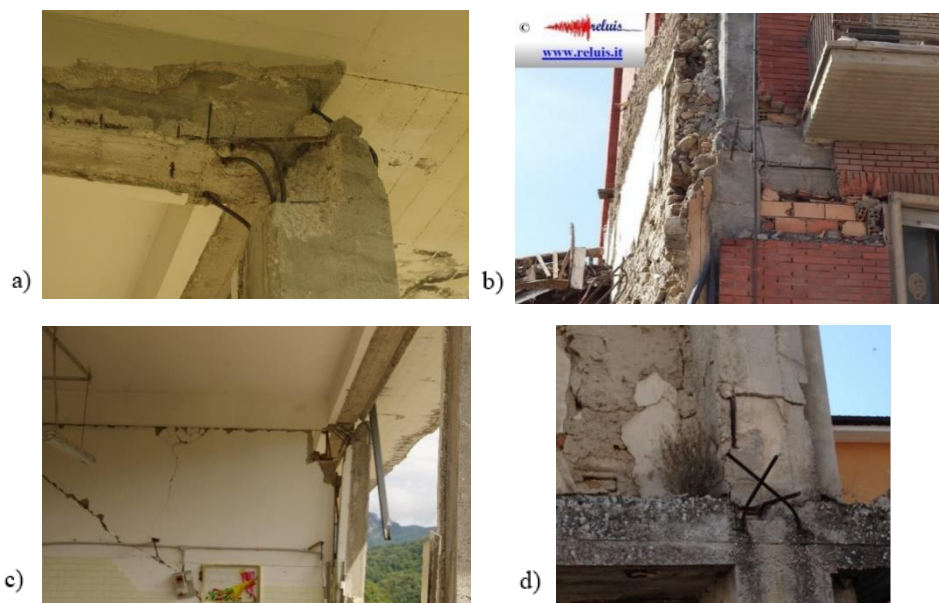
Damage in reinforced concrete beam column joint due to lack transverse reinforcement in a), b) and c). a): absence of stirrups/hoops in the beam column joint and evident poor quality of the concrete, Pescara del Tronto. b): clear separation between column and beam in the joint due to absence of reinforcement in the joint, Amatrice. c): absence of stirrups in the beam column joint, Pescara del Tronto. d): lack of stirrups in the column, Amatrice
